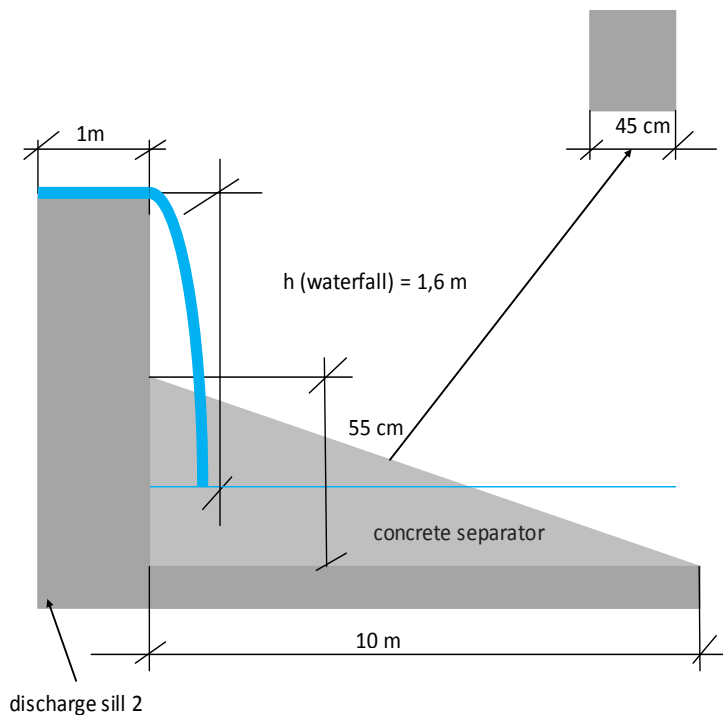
A longitudinal cross-section of the concrete separator after proposed repairs - indicative figure.
